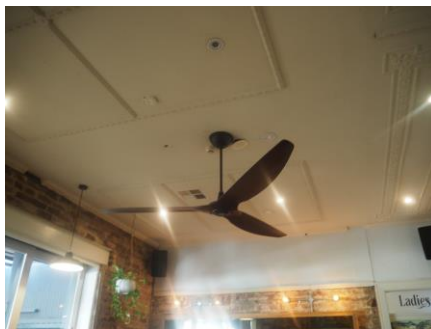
Surviving evidence of original interior configuration and detailing at first floor level.
